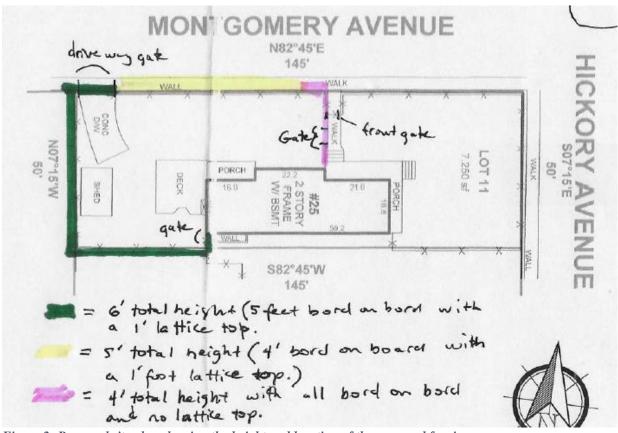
Proposed site plan showing the height and location of the proposed fencing.
